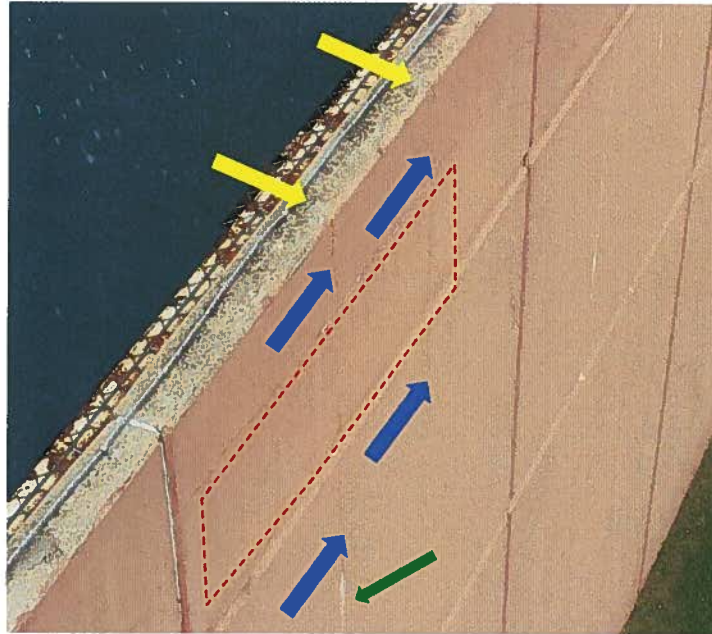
Vertical cracks aligned with prestressing strands (blue arrows). Strand ends at top of panel covered with cementitious material (yellow arrows); and efflorescence staining indicating substantial water flow from lower end of one crack (green arrow). Darker staining is visible below much of the horizontal crack (within red outline)
